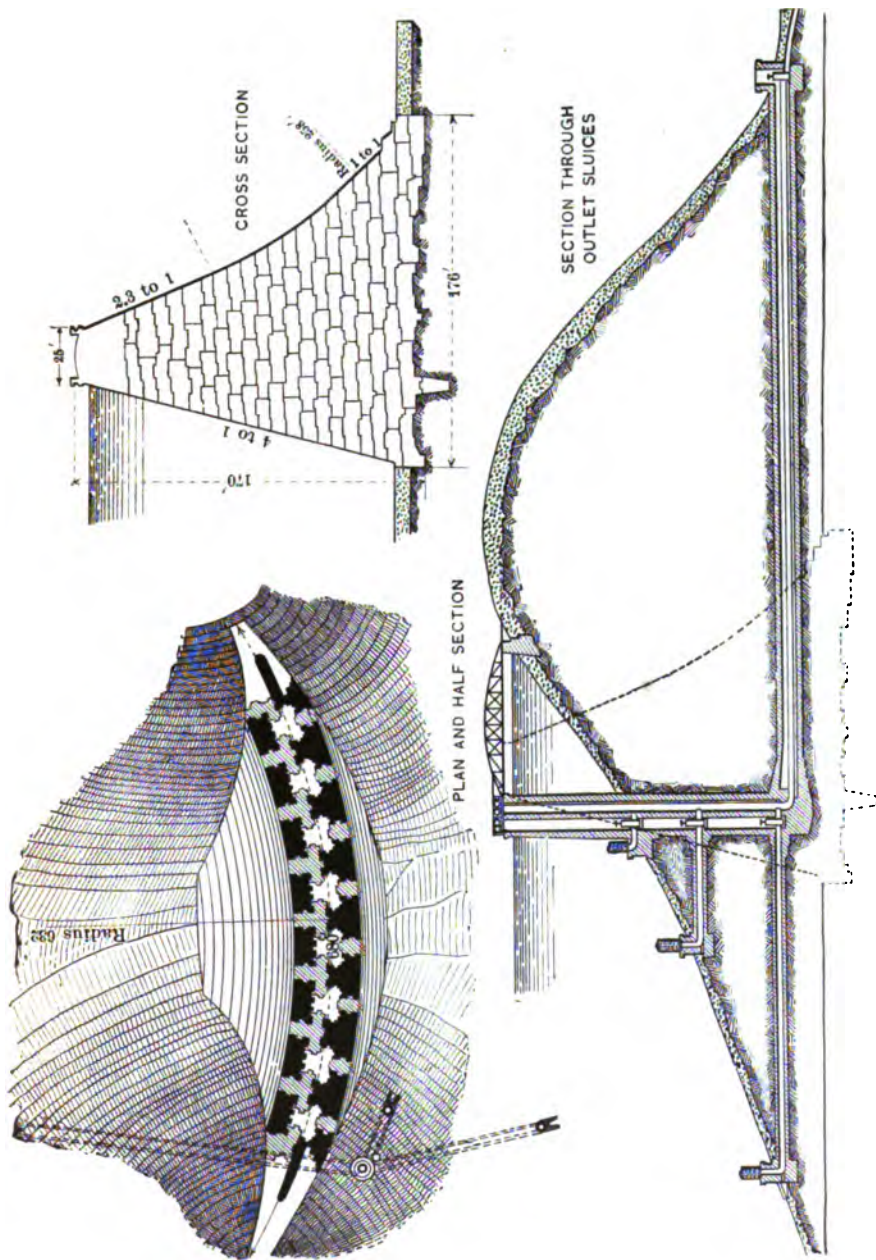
PLATE XXVI.—Plan, Cross-section, and Outlet Sluices, San Mateo Dam, California.
